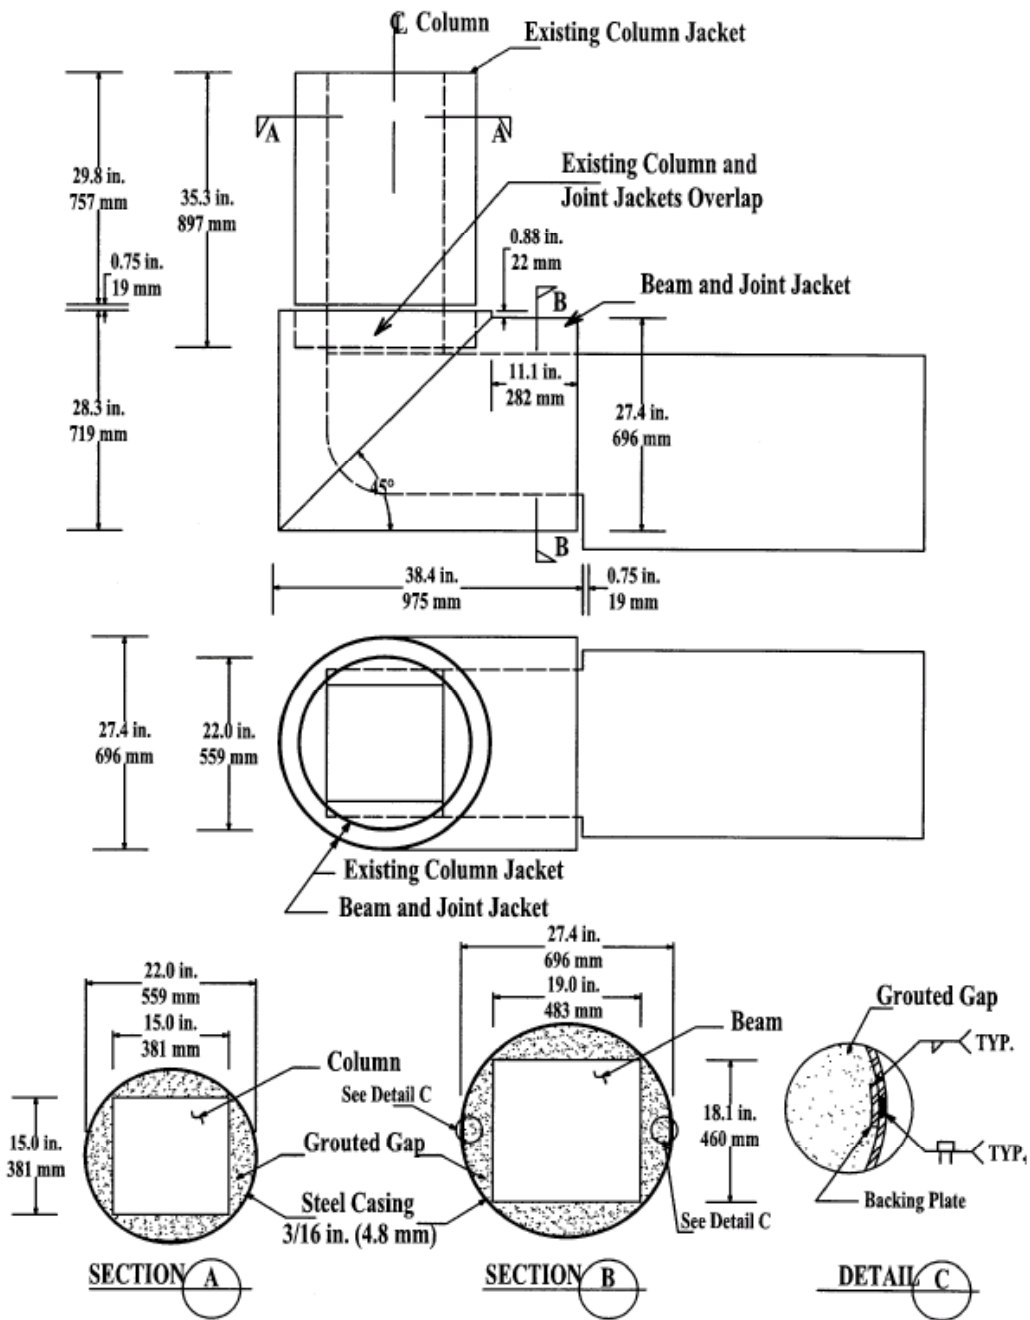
Beam and Joint Jackets Details of Specimen RSI and Specimen RSO
